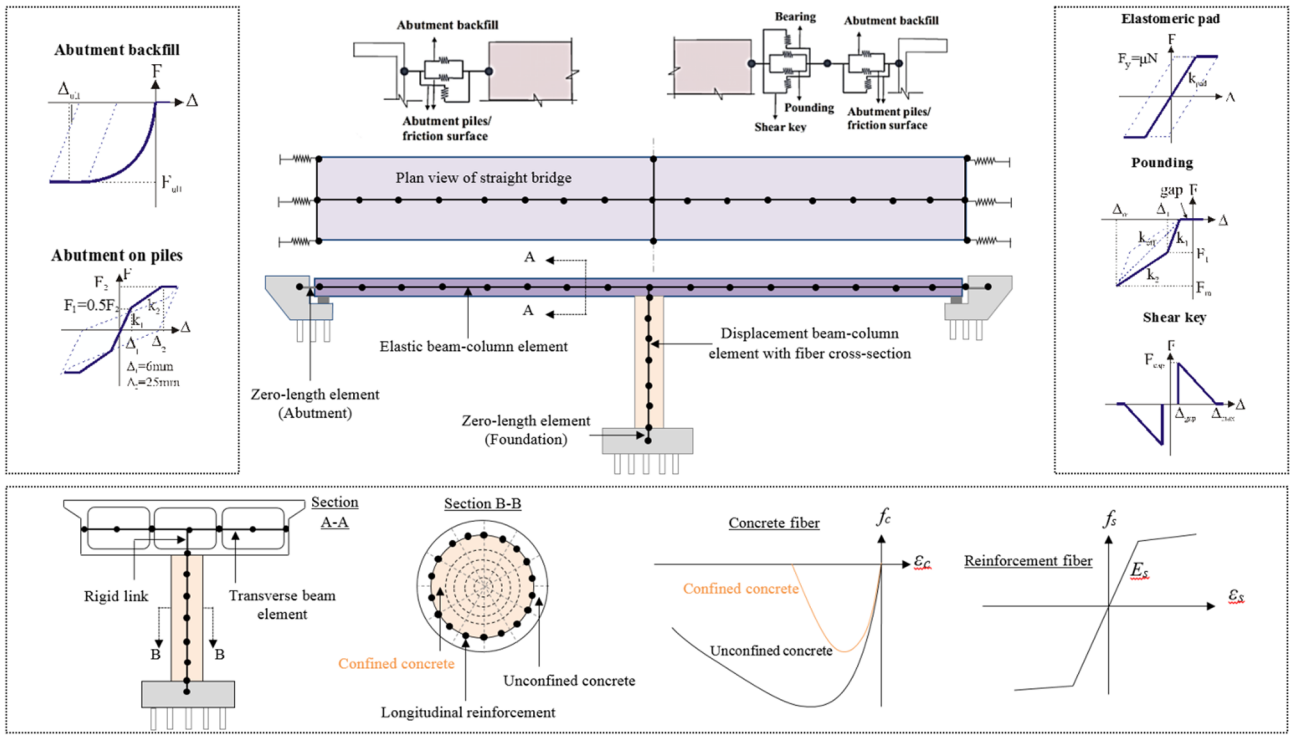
Schematic diagram of the numerical modeling of a single-frame, two-span, box-girder bridge, and the cross-sectional view of the bridge deck.
